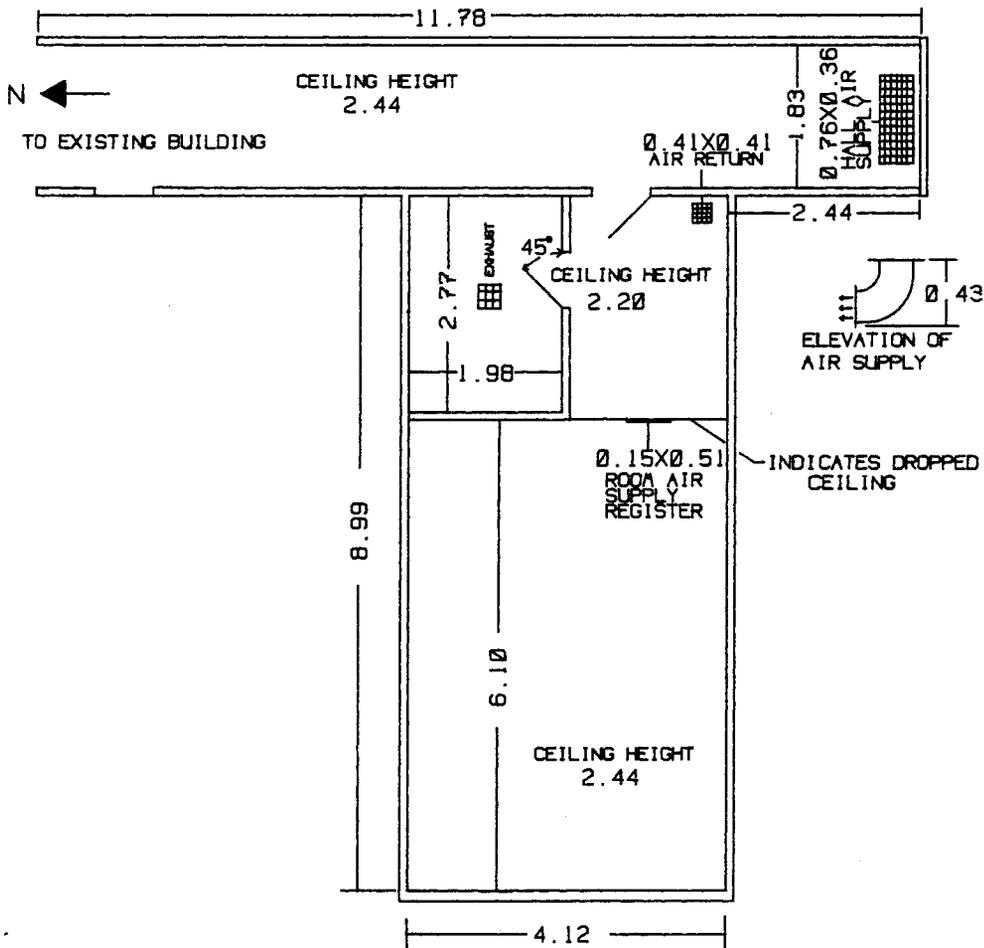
Plan view of guest room and corridor (dimensions in meters).
